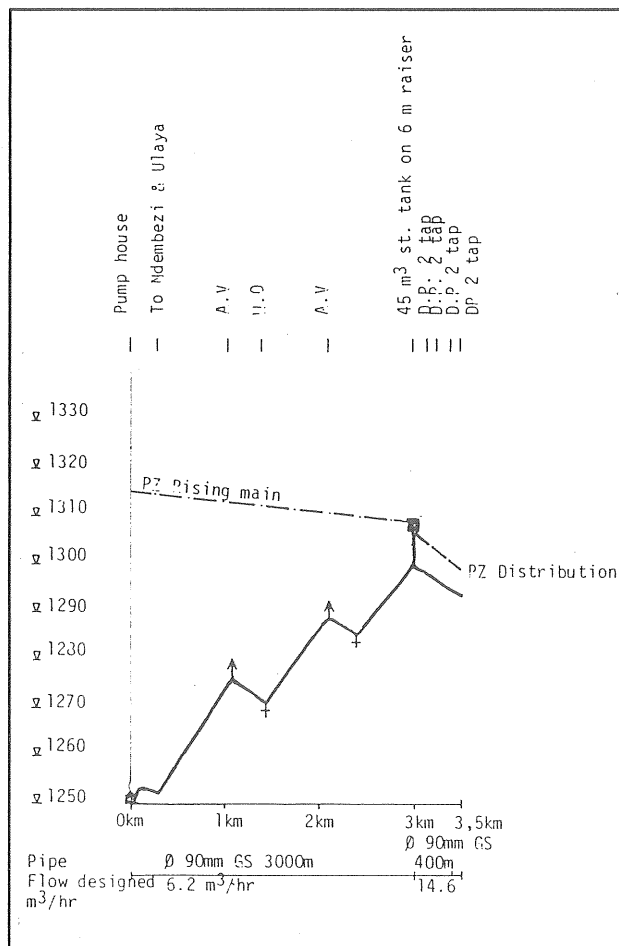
Longitudinal section of the pipe to the Nkinga Village Water Tower.
